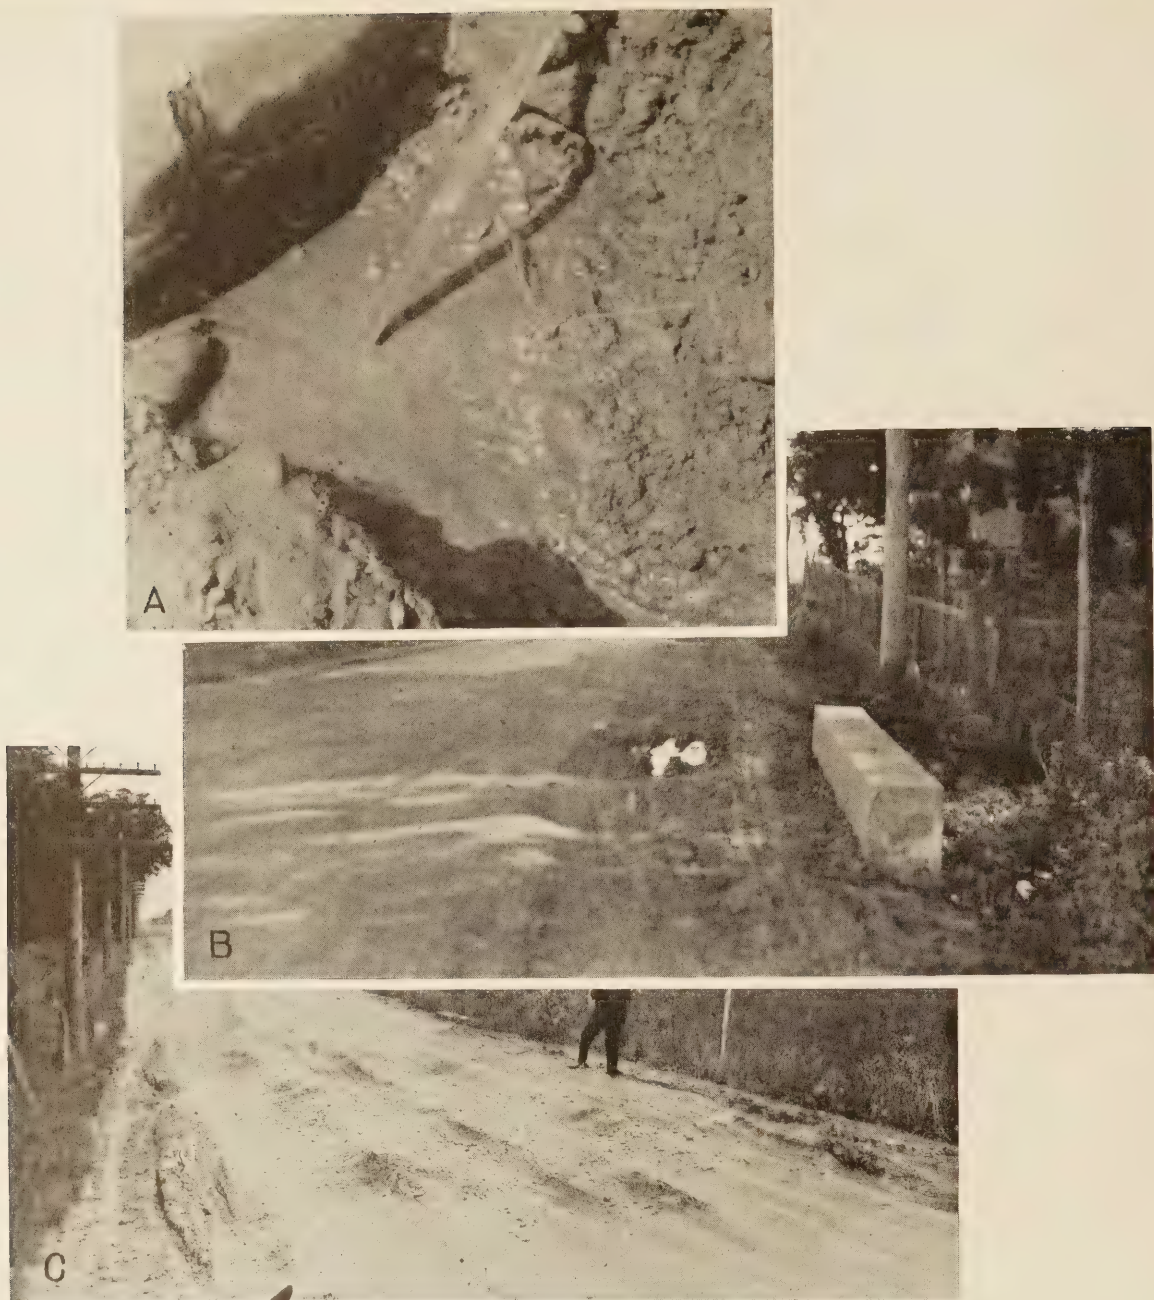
A, WATER ESCAPING FROM BENEATH PAVEMENT THROUGH EXCAVATION IN SHOULDER; B, POOL OF WATER TRAPPED ON SHOULDER AFTER A RAIN; C, FAILURE DUE TO WATER TRAPPED ON FILL BY IMPERVIOUS SHOULDER
